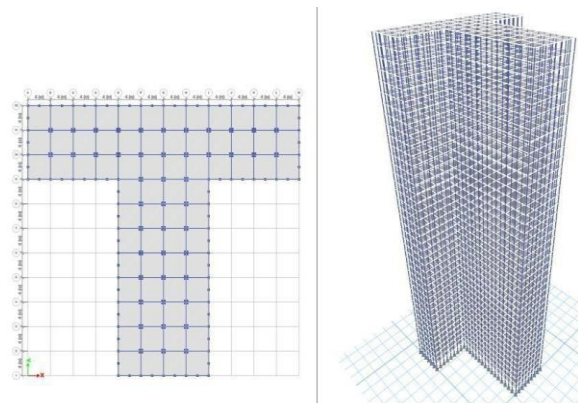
Plan view and 3-Dimensional view of T-Shape model
